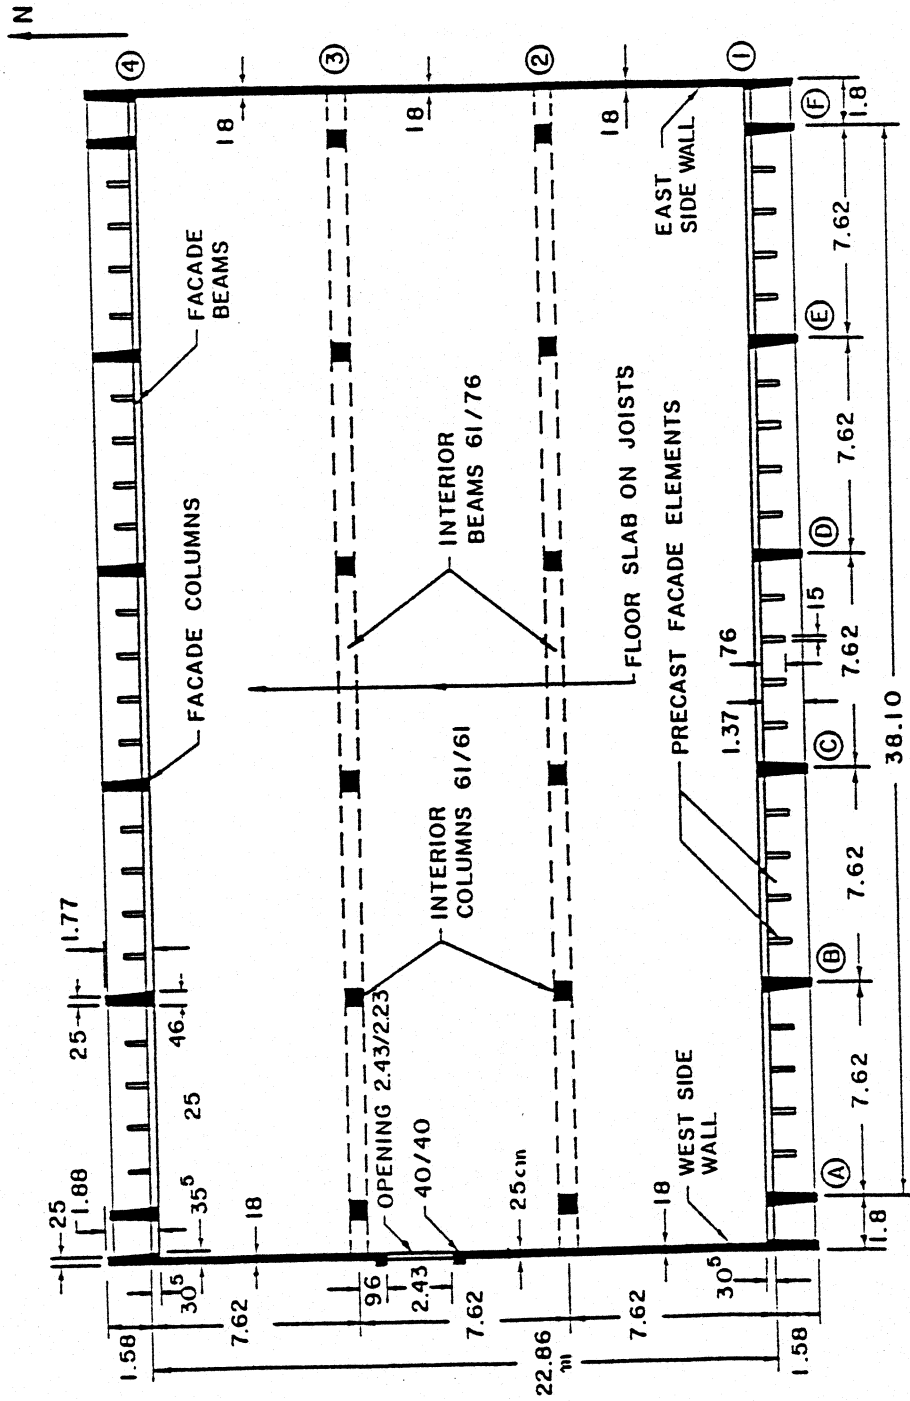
Typical floor layout of the Imperial County Services Building in El Centro, after Kojić et al. (1984).
